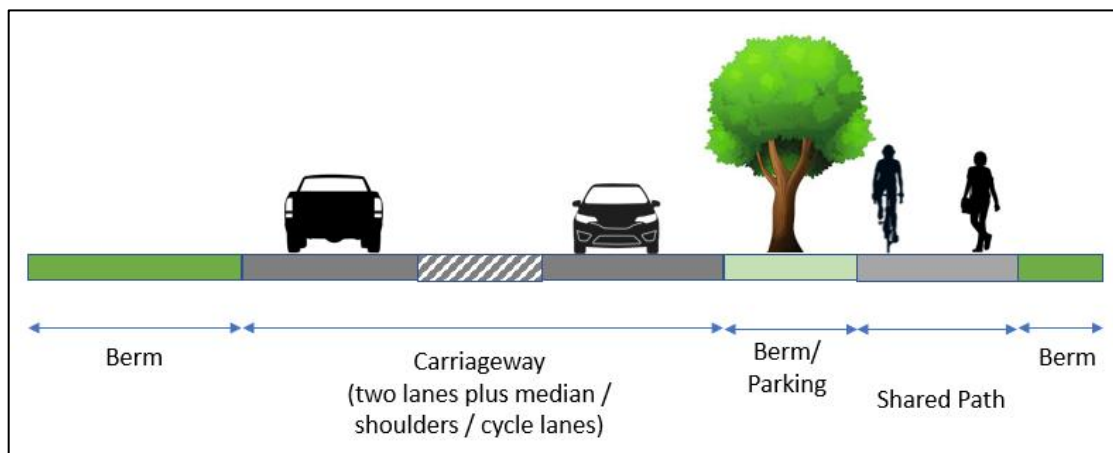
Initial Potential Morrinsville-Tahuna Road Cross Section
